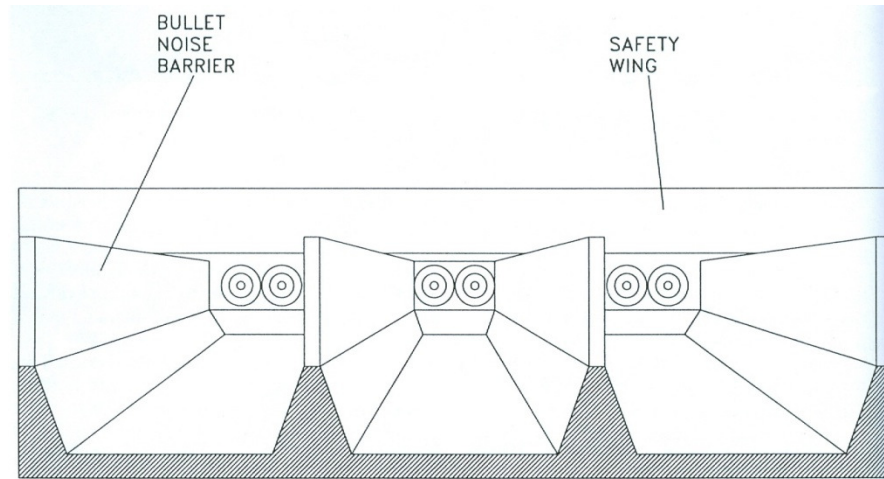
Noise barriers for effective elimination of sound leaving the shooting range. [7]
